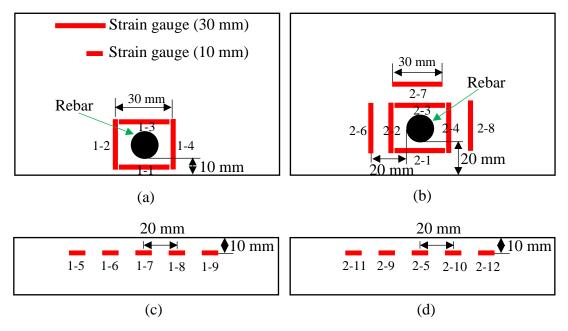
Layout of strain gauges (a) front view of Specimen 1, (b) front view of Specimen 2, (c) cover surface of Specimen 1, and (d) cover surface of Specimen 2
